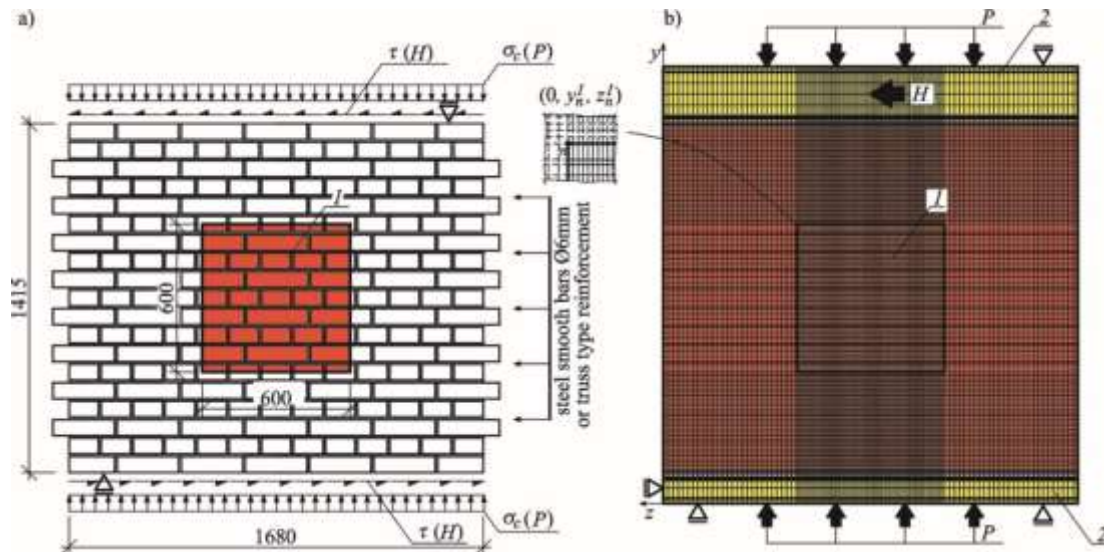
Masonry walls: a) test specimens [22, 23], b) numerical macromodel - stage I, (I – wall fragment under analyzed 600×600 mm, 2 – element of the test stand)
